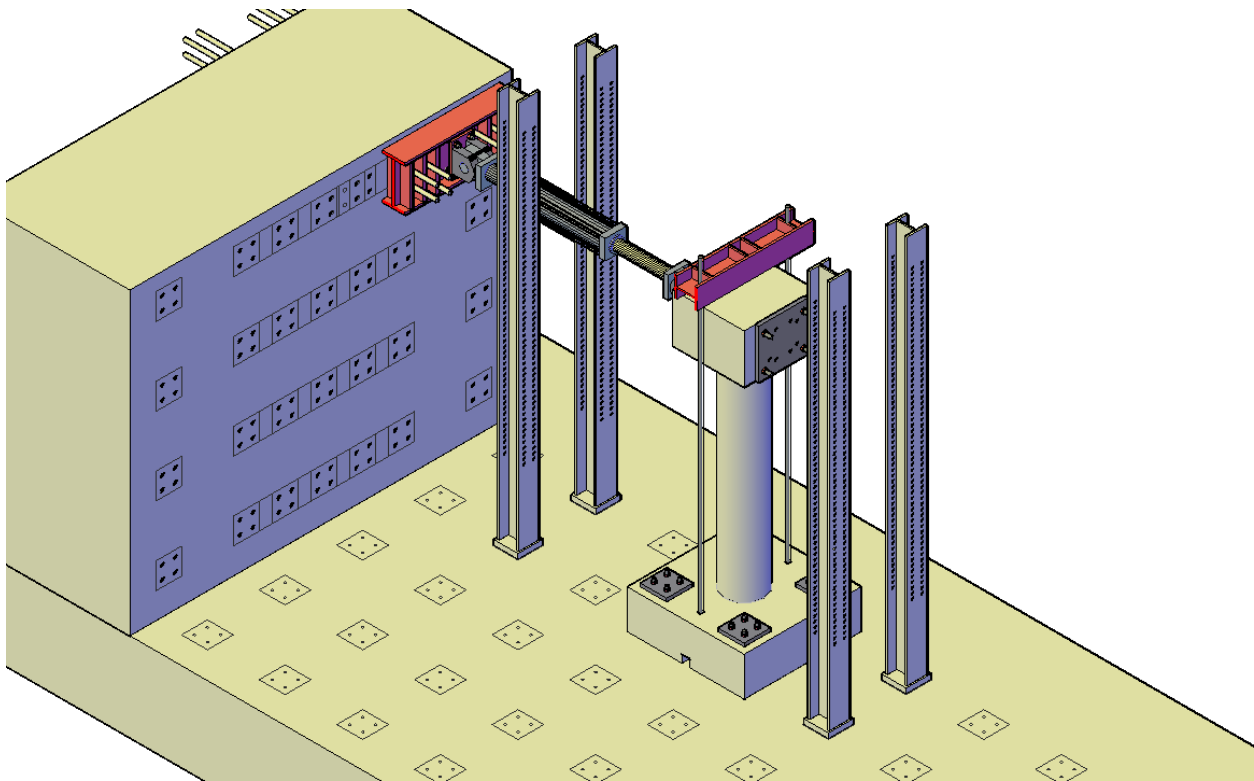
3D rendering of test setup for columns C1, C2, C3 and C4
